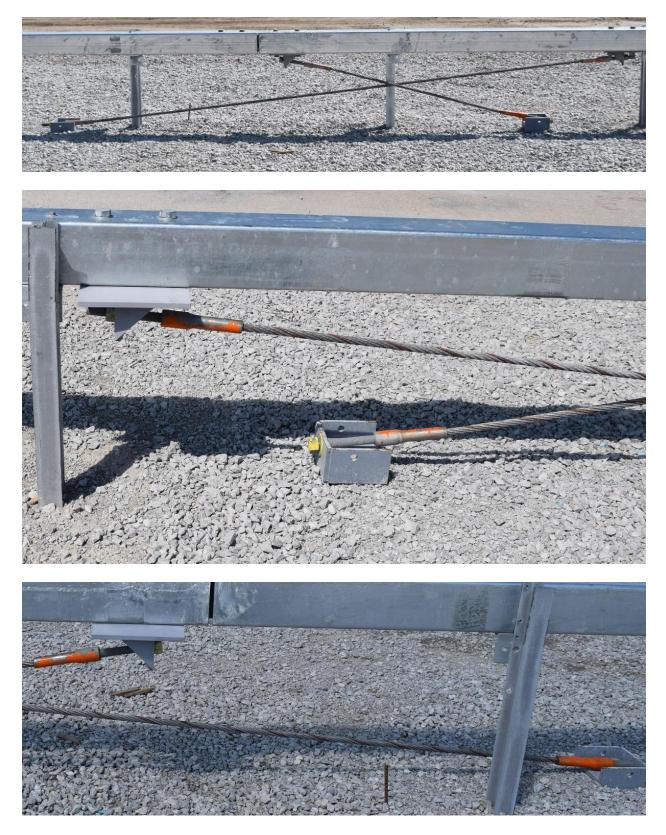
Test Installation, Upstream Anchor Details, Test No. NYT-1
